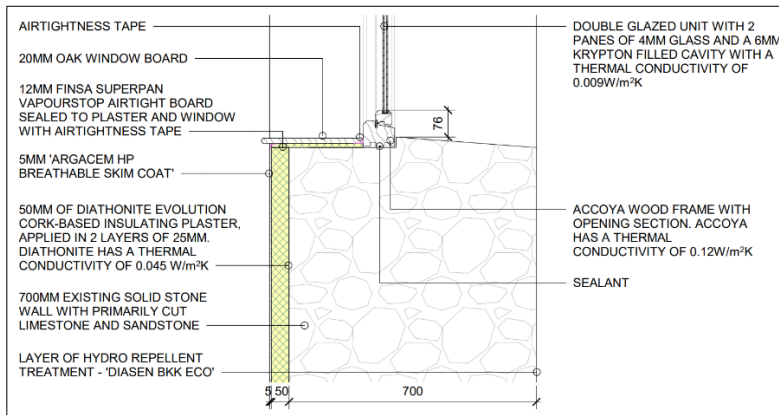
Accoya Windowsill & Head Detail (Source: Author).
